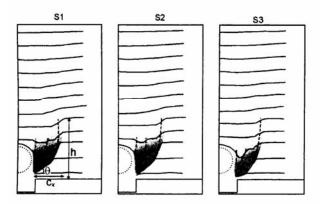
Failure mechanisms of the transverse sections of Model 1 (flexible pipe in loose backfill)
